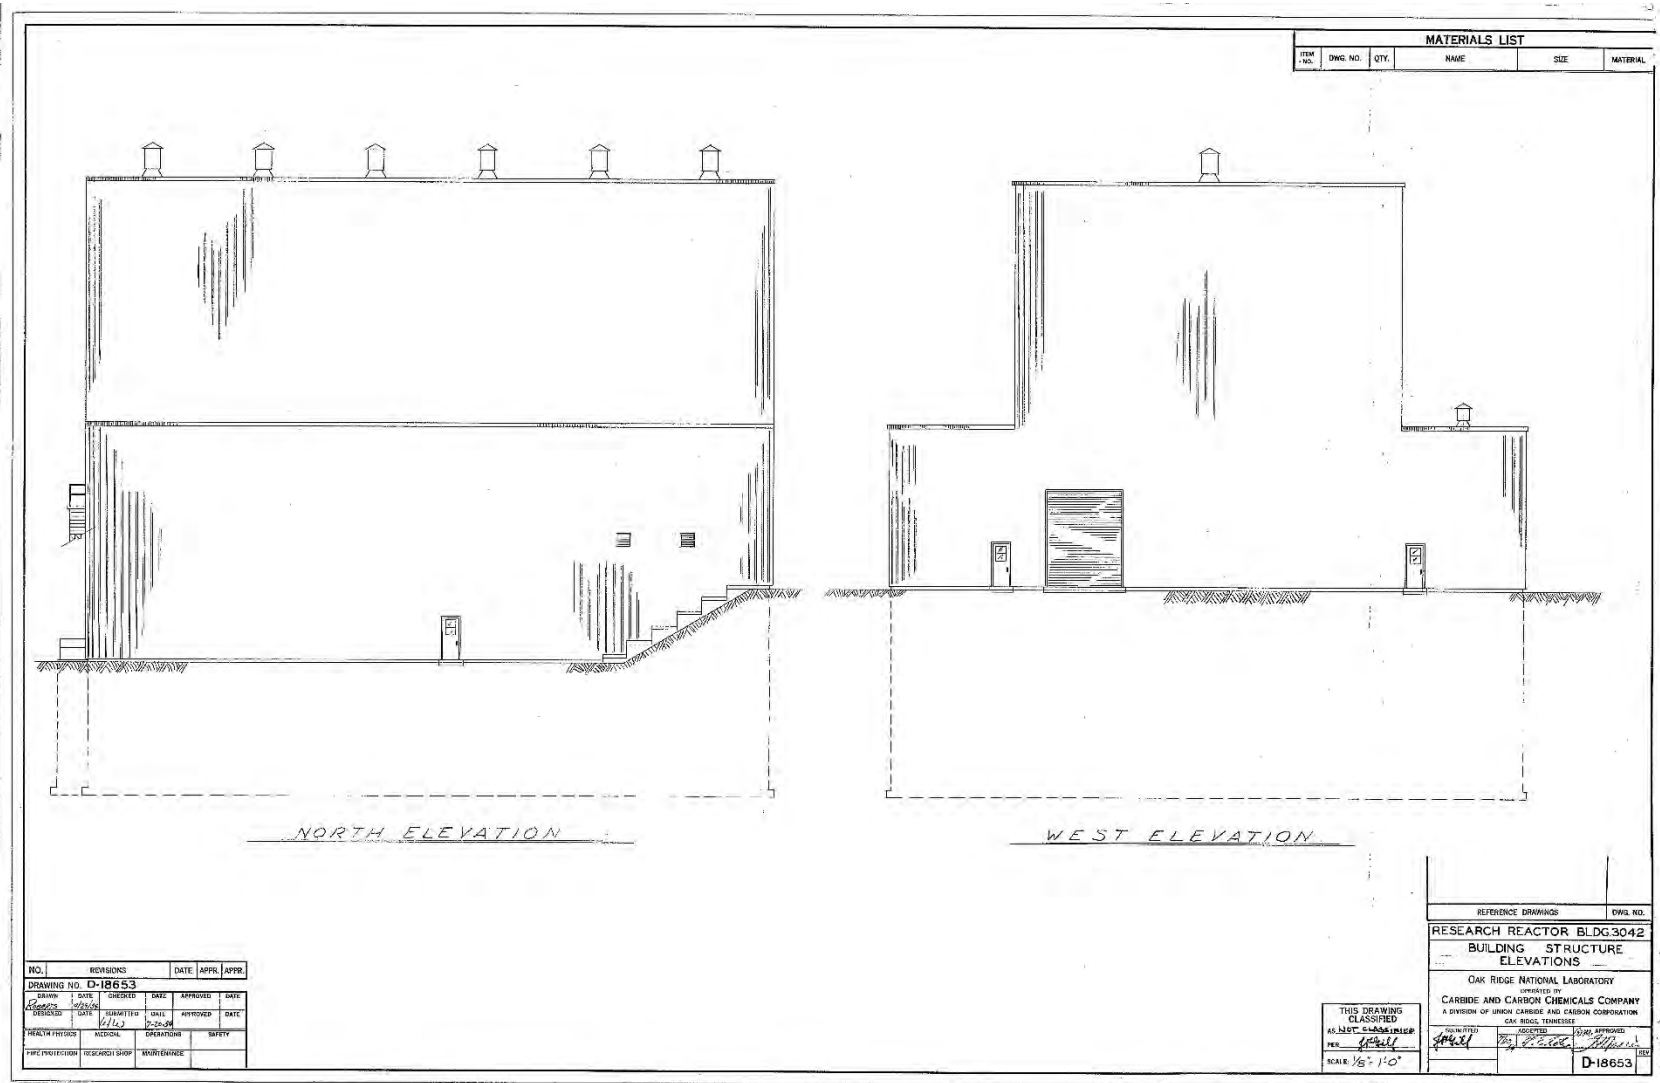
North and west elevations of Building 3042 (Oak Ridge National Laboratory, April 29, 1954).
